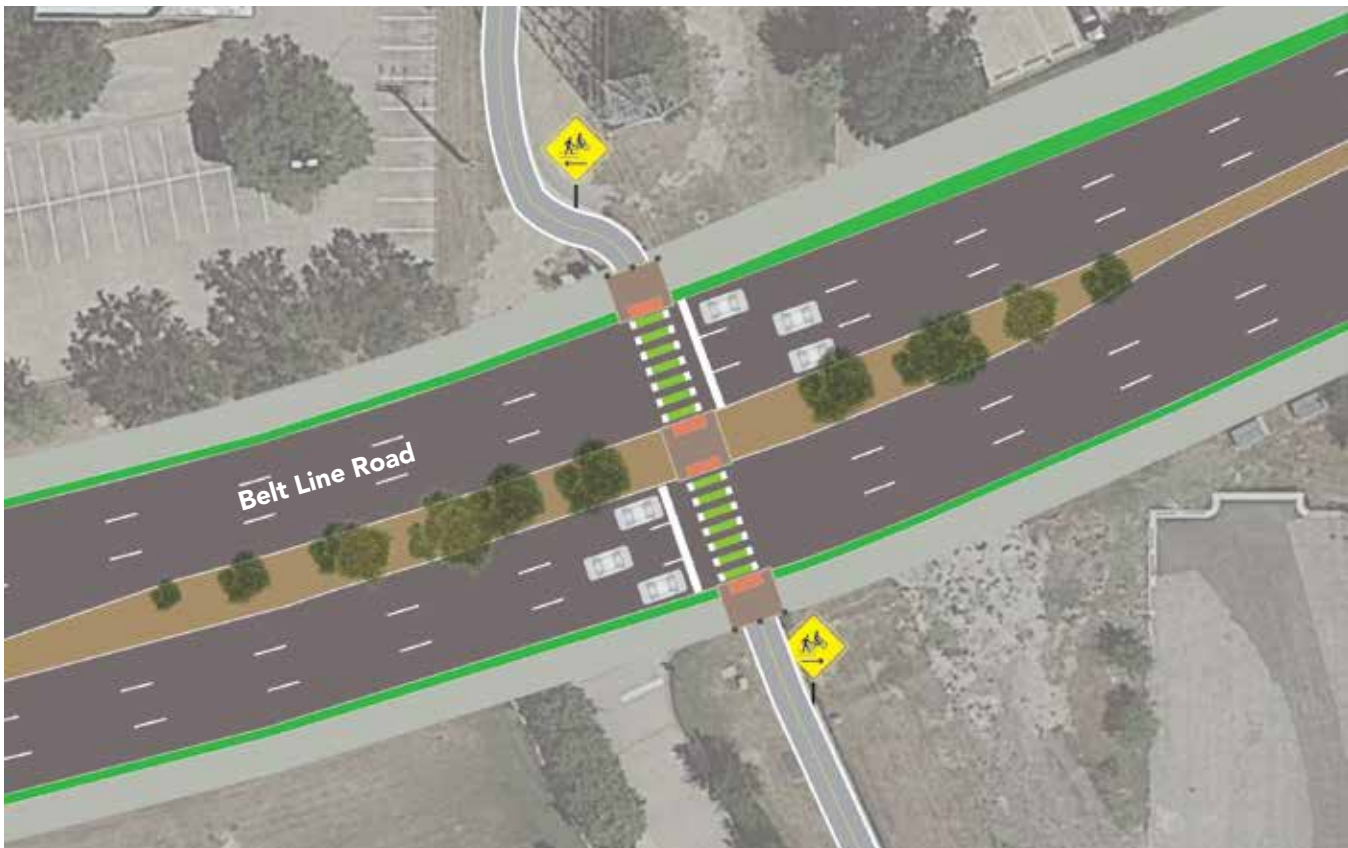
Prototypical Arterial Street Mid-Block Crossing (Belt Line Road)
